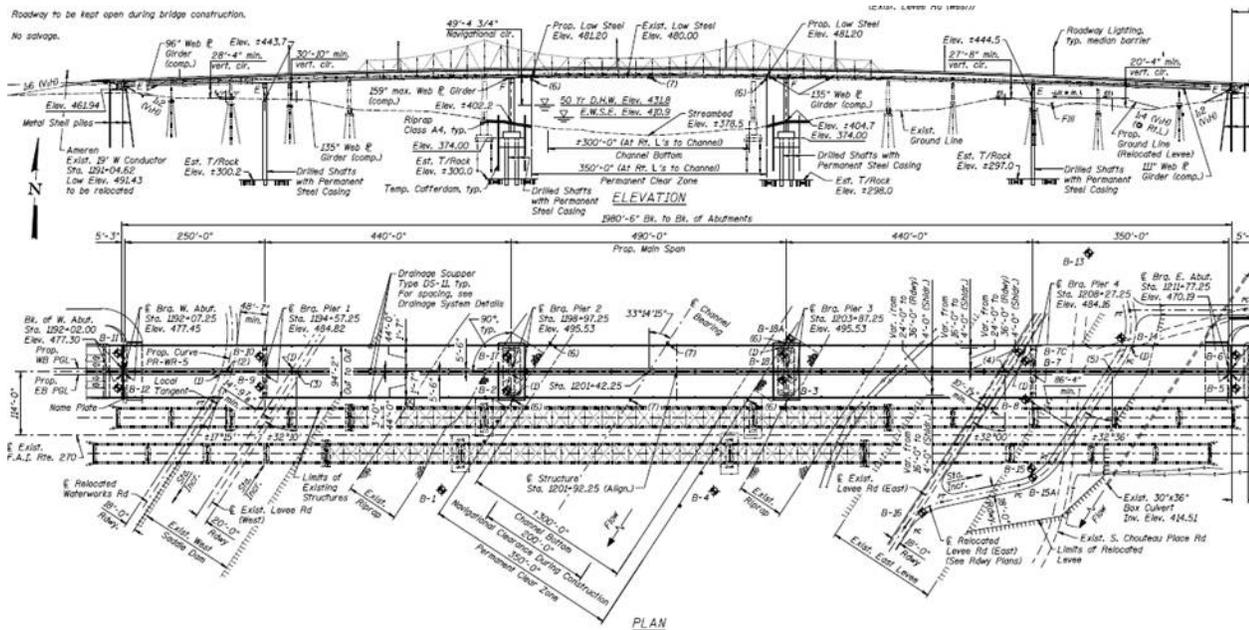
Plan and Elevation Drawing of the new I-270 Bridge over the Chain of Rocks Canal
